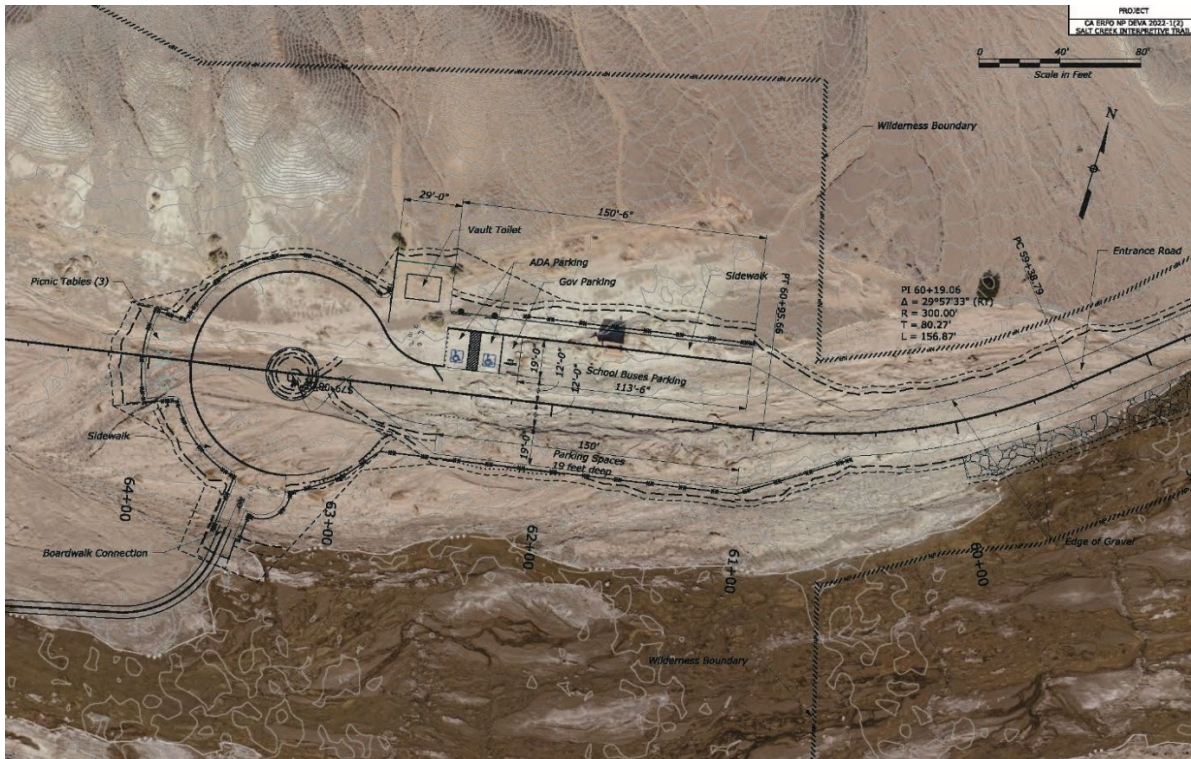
PARKING LOT CONCEPTUAL DESIGN
